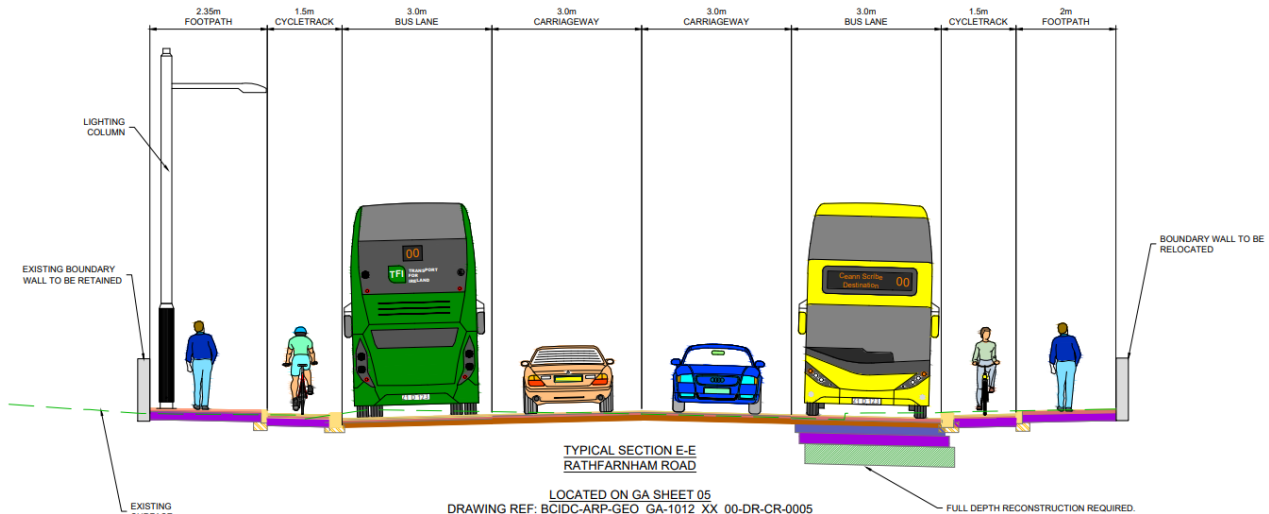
Typical Cross-section of Proposed Scheme between Bushy Park Road and Terenure Cross
